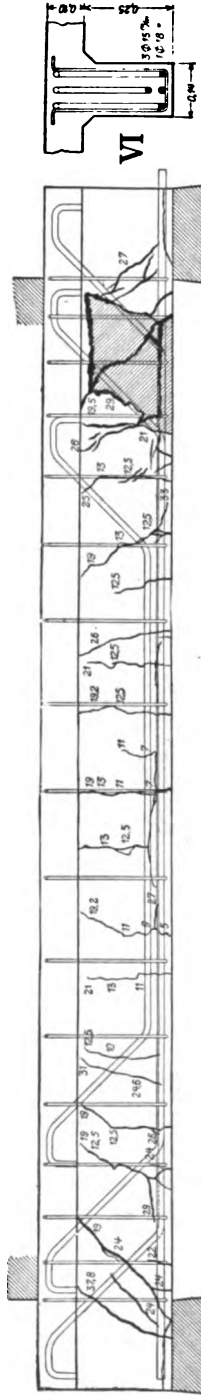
Beam VI, breaking load 37.8 t. (41.5 tons).
